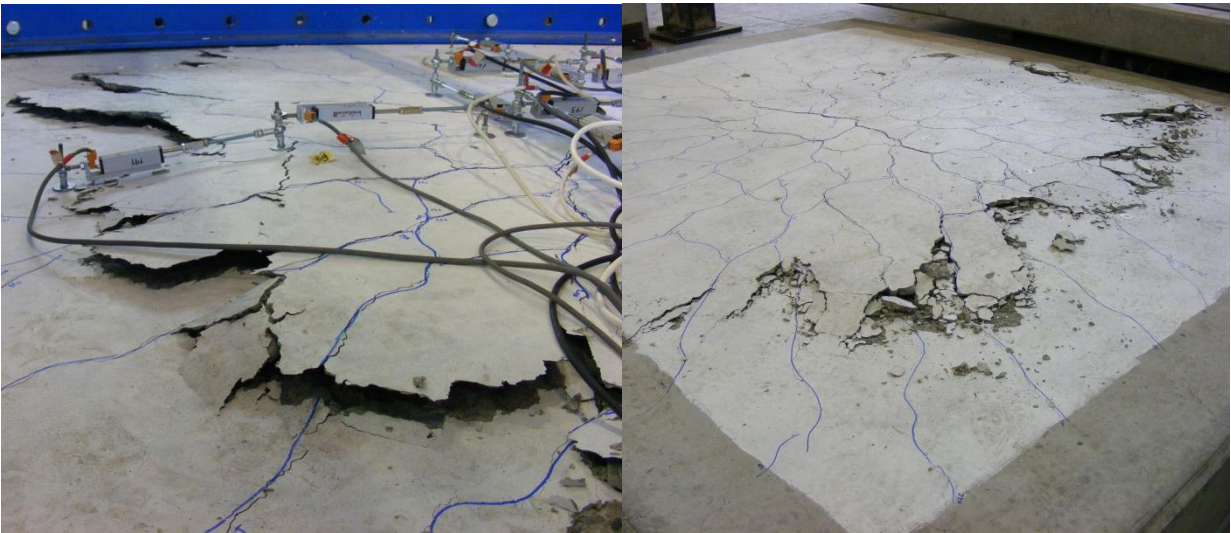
Steel reinforced slab at failure. Note the approximately circular failure on the top surface.
